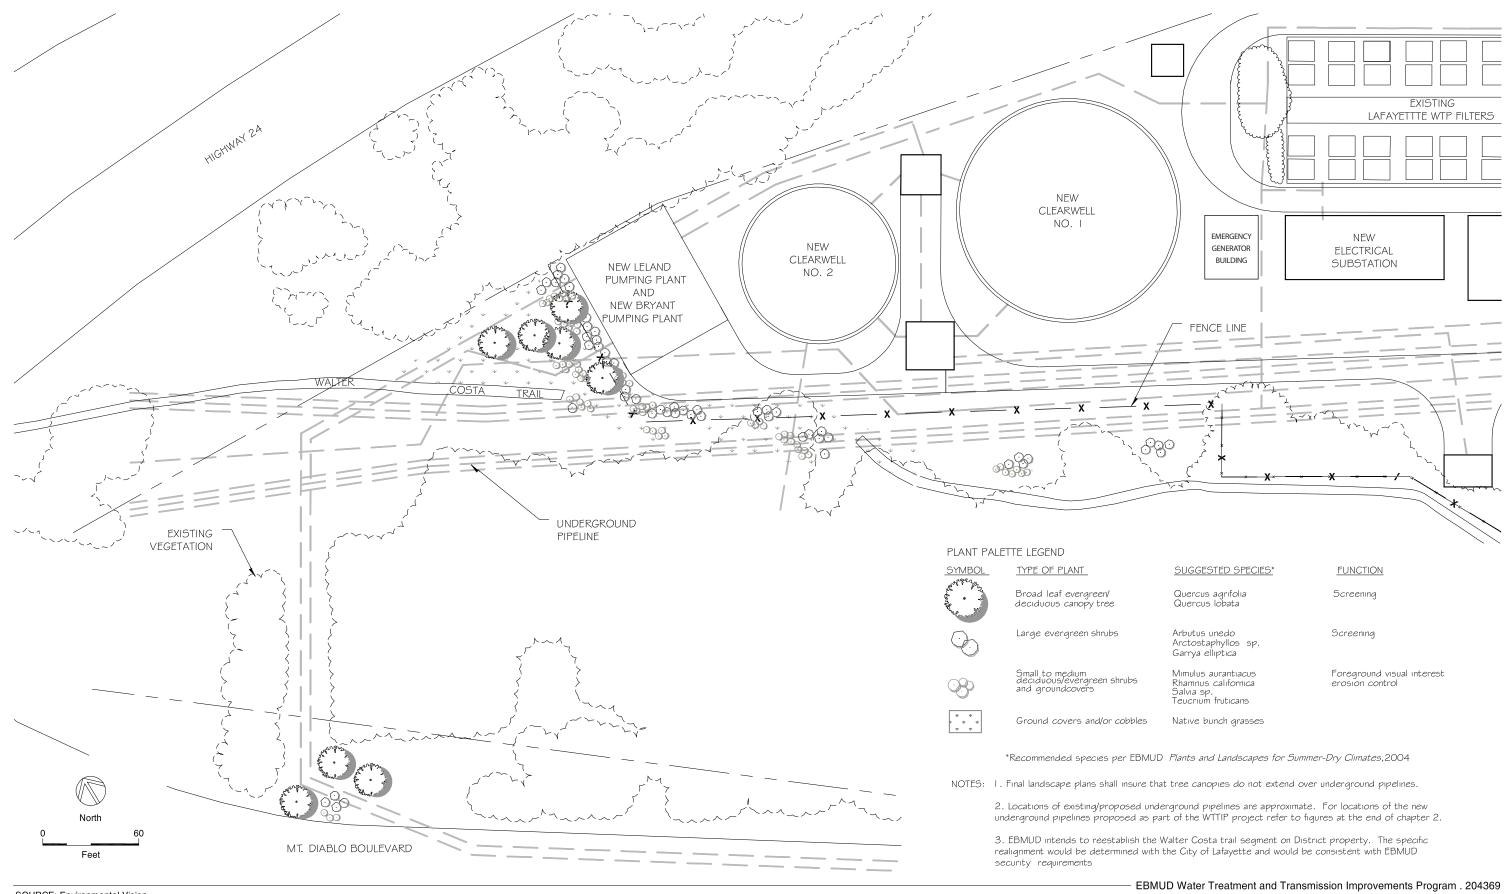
LWTP-4 Conceptual Landscape Plan - Lafayette WTP Alternative 1
